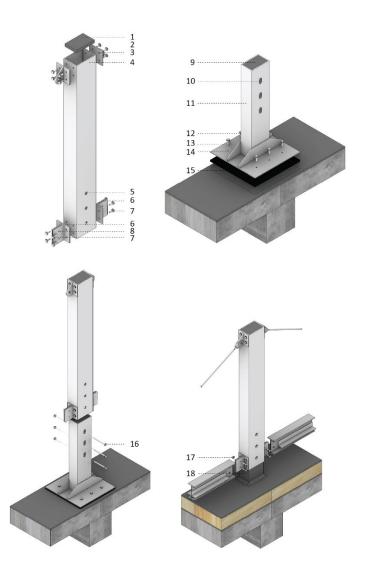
shows the column element, composed of the main rectangular cross-section, in which the brackets to receive the floor beams and the tensile roods are pre-installed through bolted connections. The main support is welded to the bottom plate and reinforcement stiffeners. The holes to receive the column segment are predrilled considering the required tolerance that might be needed to align all the supports. This element is mounted to the existing slab on top of a thermal break plate to reduce thermal losses that a direct connection could cause. After the main support is mounted, the insulation layer is installed and on top, the new water barrier layer. The bottom figures show the condition in which the insulated plates are present, for which the segment where the support goes is removed, followed by the installation of a vapor barrier. Then the support is installed with the new insulation and waterproof layers.
